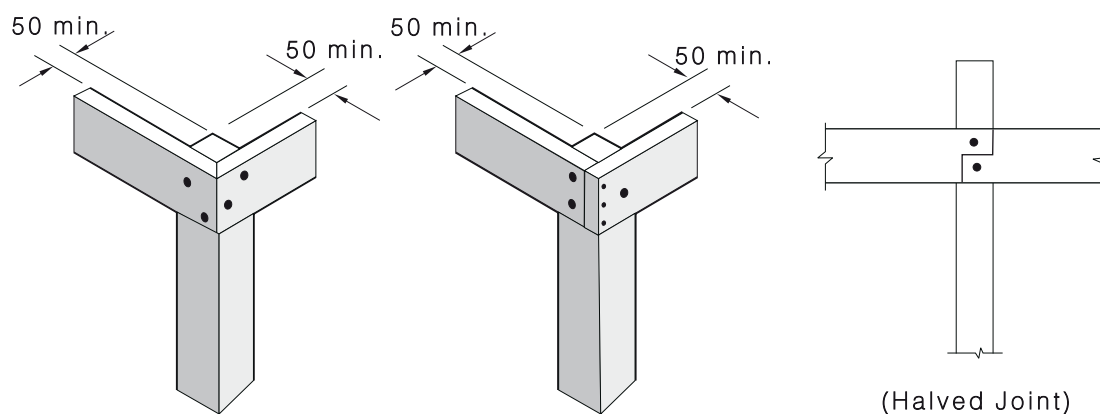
JOINING OF TOP PLATES AND RING BEAMS
